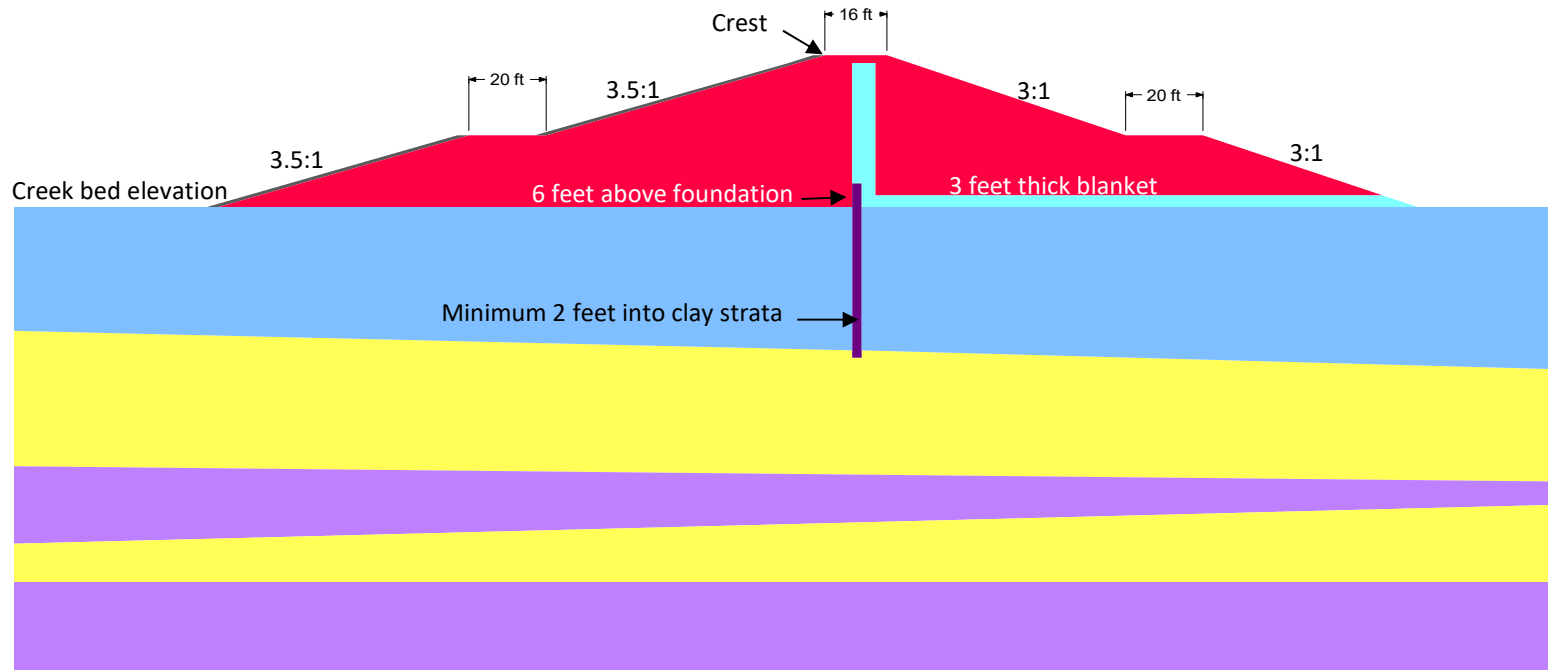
Alternative 3 Typical Section Used in Slope Stability Analysis
